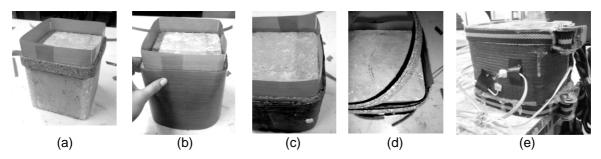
Construction of the specimens with post-tensioned CFRP jackets: (a) the cork ring; (b) neoprene sheet; (c) Prefabricated precured CFRP jacket; (d) cork ring; (e) block of the bottom and top ends using a nylon strip with post tensioning system.
